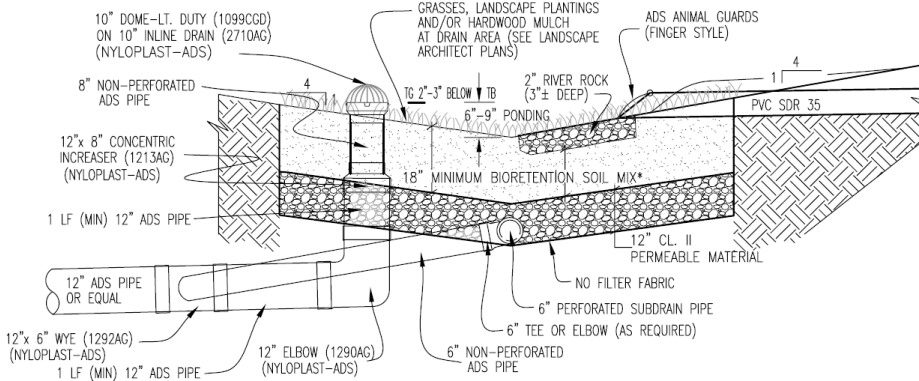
Configuration of Walden Park Commons Bioretention Facilities
